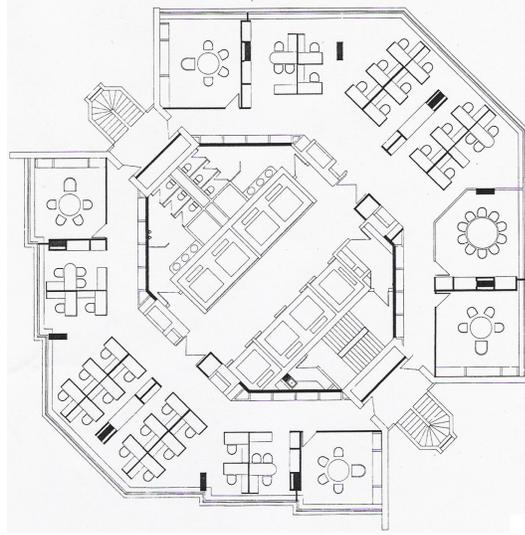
Typical floor plans of buildings of Sabancı Center (Tümay, F. H. (1992). "Proje Konsepti." *Tasarım*, 20. p. 54.)
